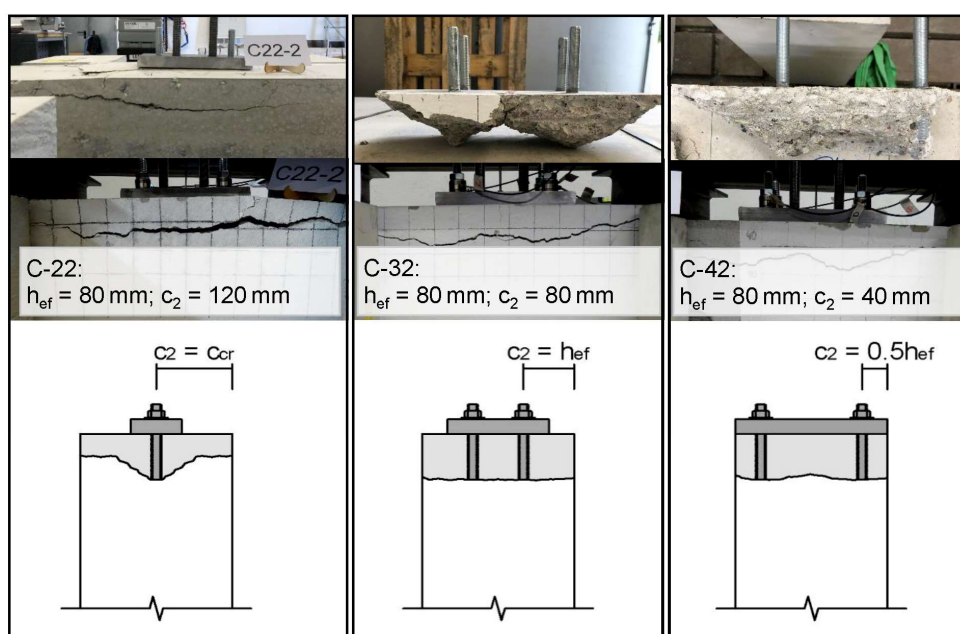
Typical crack patterns at the side surface of the concrete specimen upon failure in test series C-22, C-32, and C-42.
